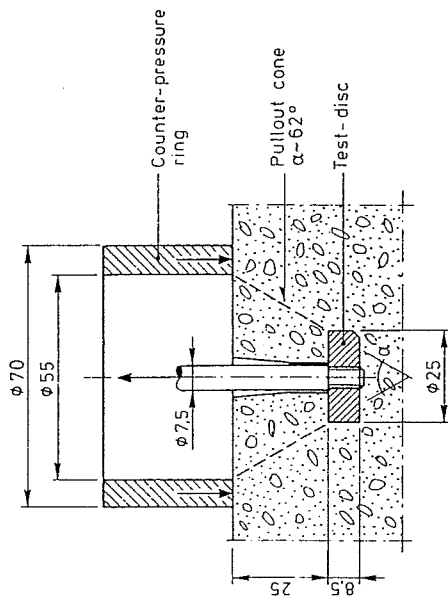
Test set-up for the so-called LOK-TEST pullout system. (Dimensions in mm).
